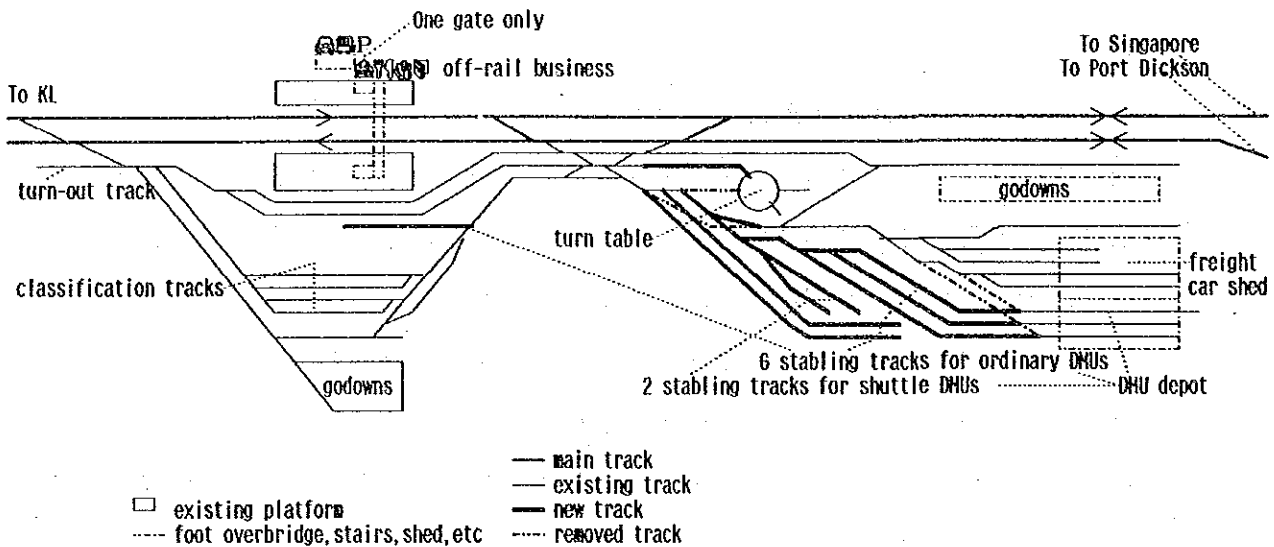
Track Layout of Seremban Station in RBCS
